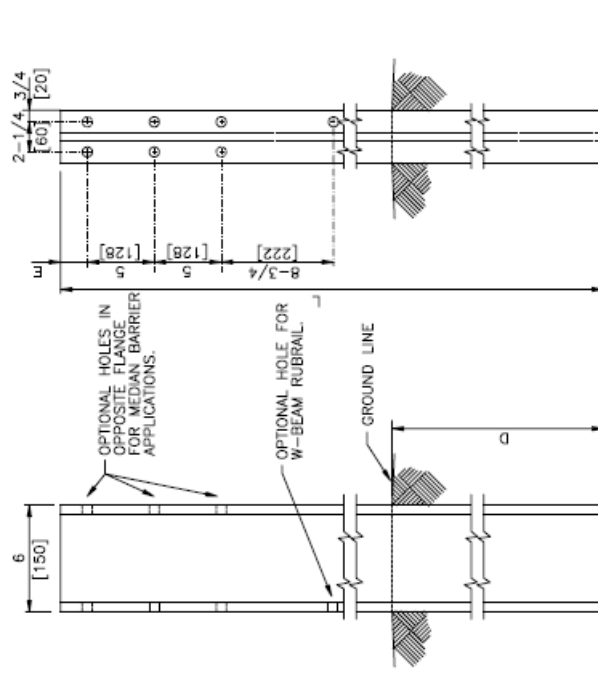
Typical Modified Thrie-Beam Guardrail System (SGR09b).
